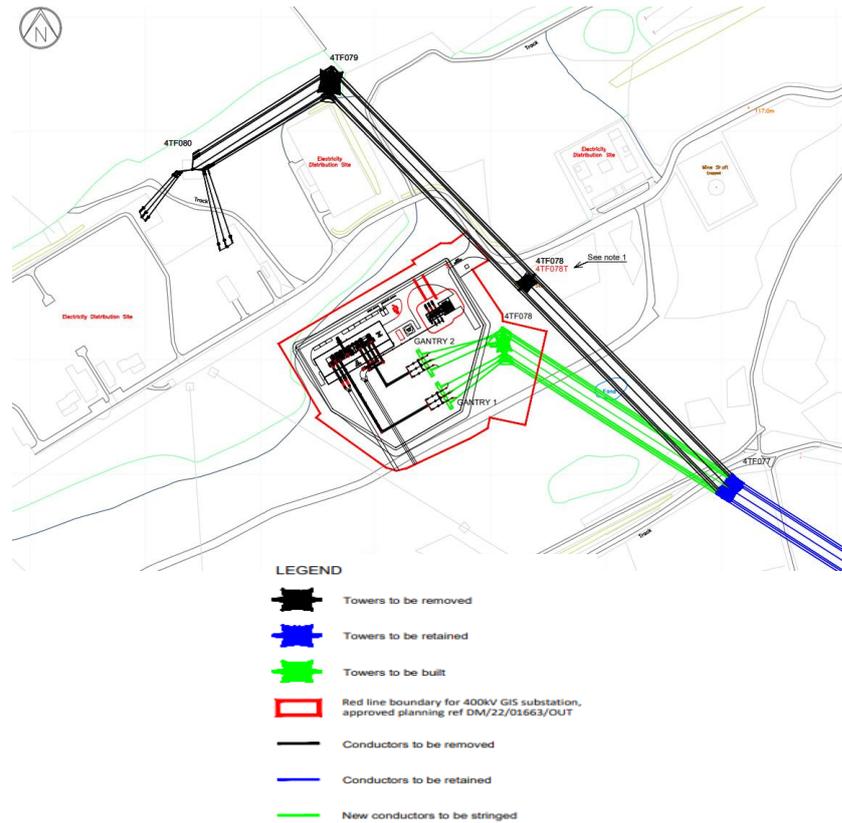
Layout showing OHL and Pylons to be installed and removed
